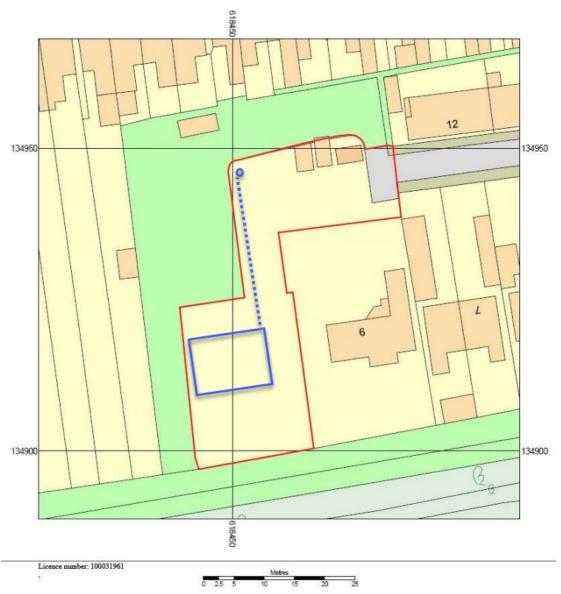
Location Plan and area of watching brief of foundations (blue rectangle). Service trench and septic tank nor the north)
